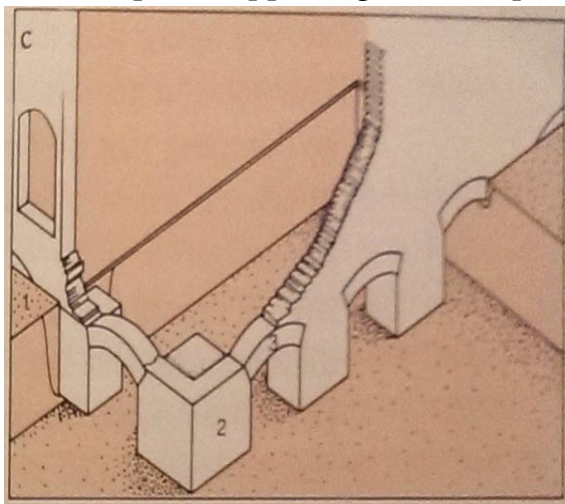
Construction method of heavy brick piers, connected by arches carrying complete brick walls. (Janssen and Treling 1990. Cropped by author)
